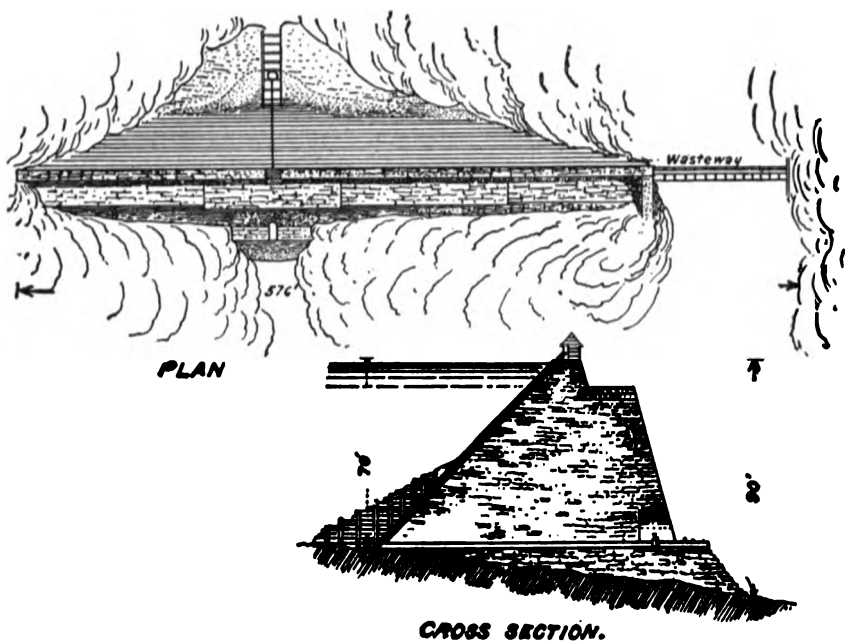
PLAN AND CROSS-SECTION OF THE FORDYCE ROCK-FILL DAM,
